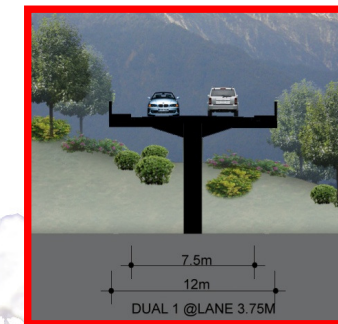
Proposed dual-1 road (3.75m) to be constructed
